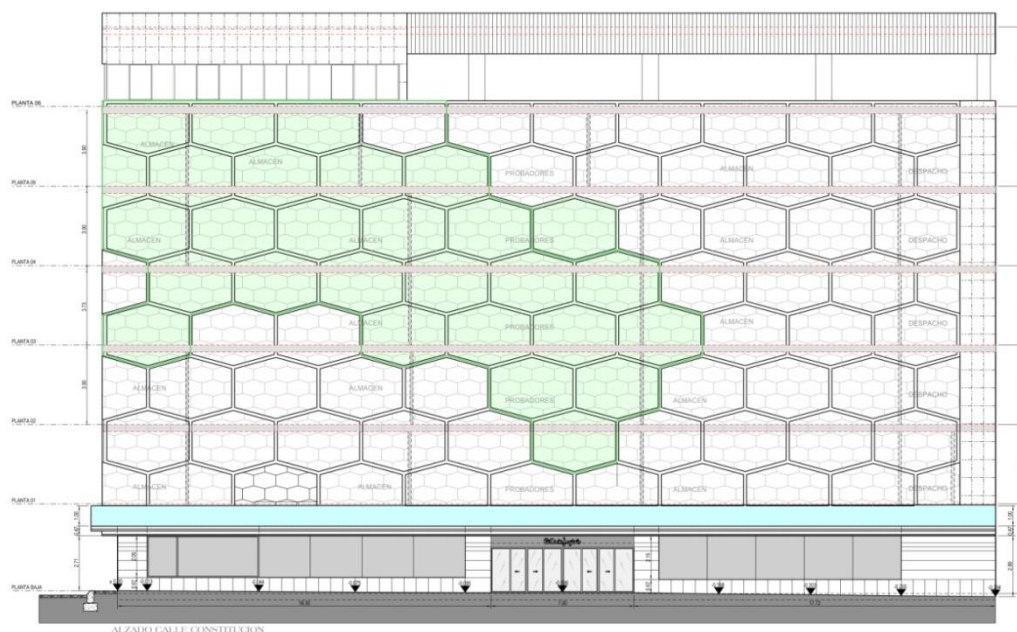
North green façade - El Corte Inglés (Source: SingularGreen).
